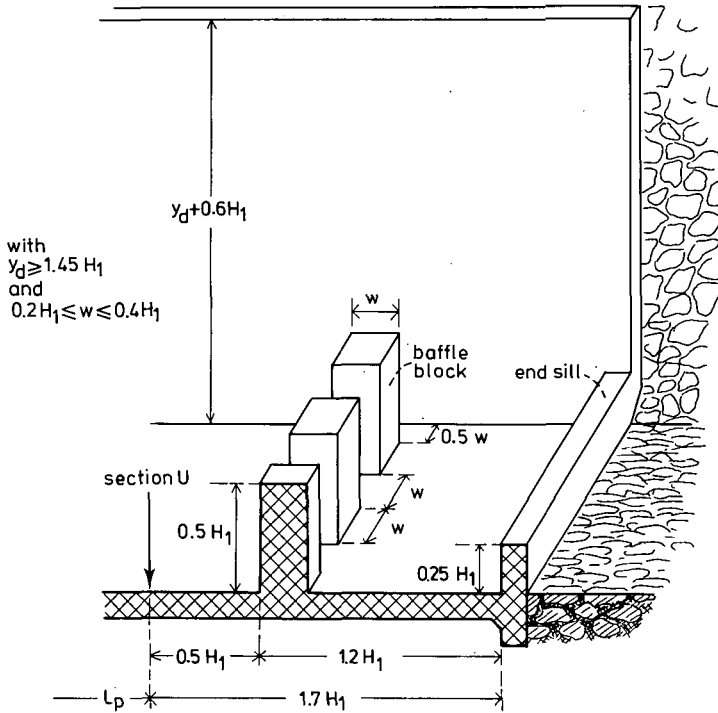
Section over center line of the baffle block type basin downstream from section U (Donnelly and Blaisdell 1954)
